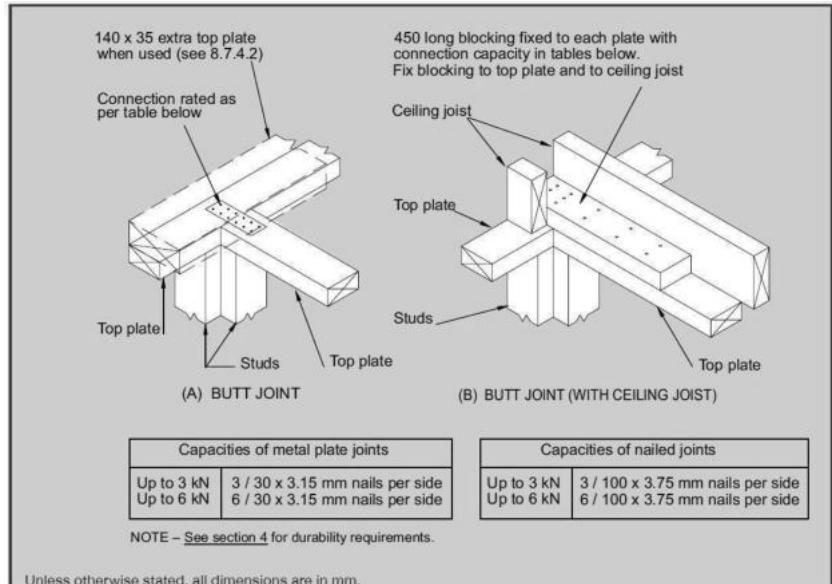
Connecting top plates to external walls at right angles – Walls containing bracing (see 8.7.3.4)
